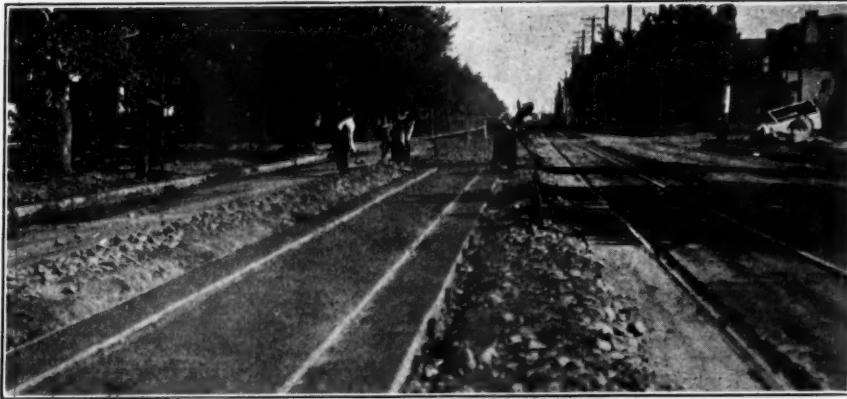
COVERING A NEWLY CONSTRUCTED CONCRETE PAVEMENT WITH EARTH
